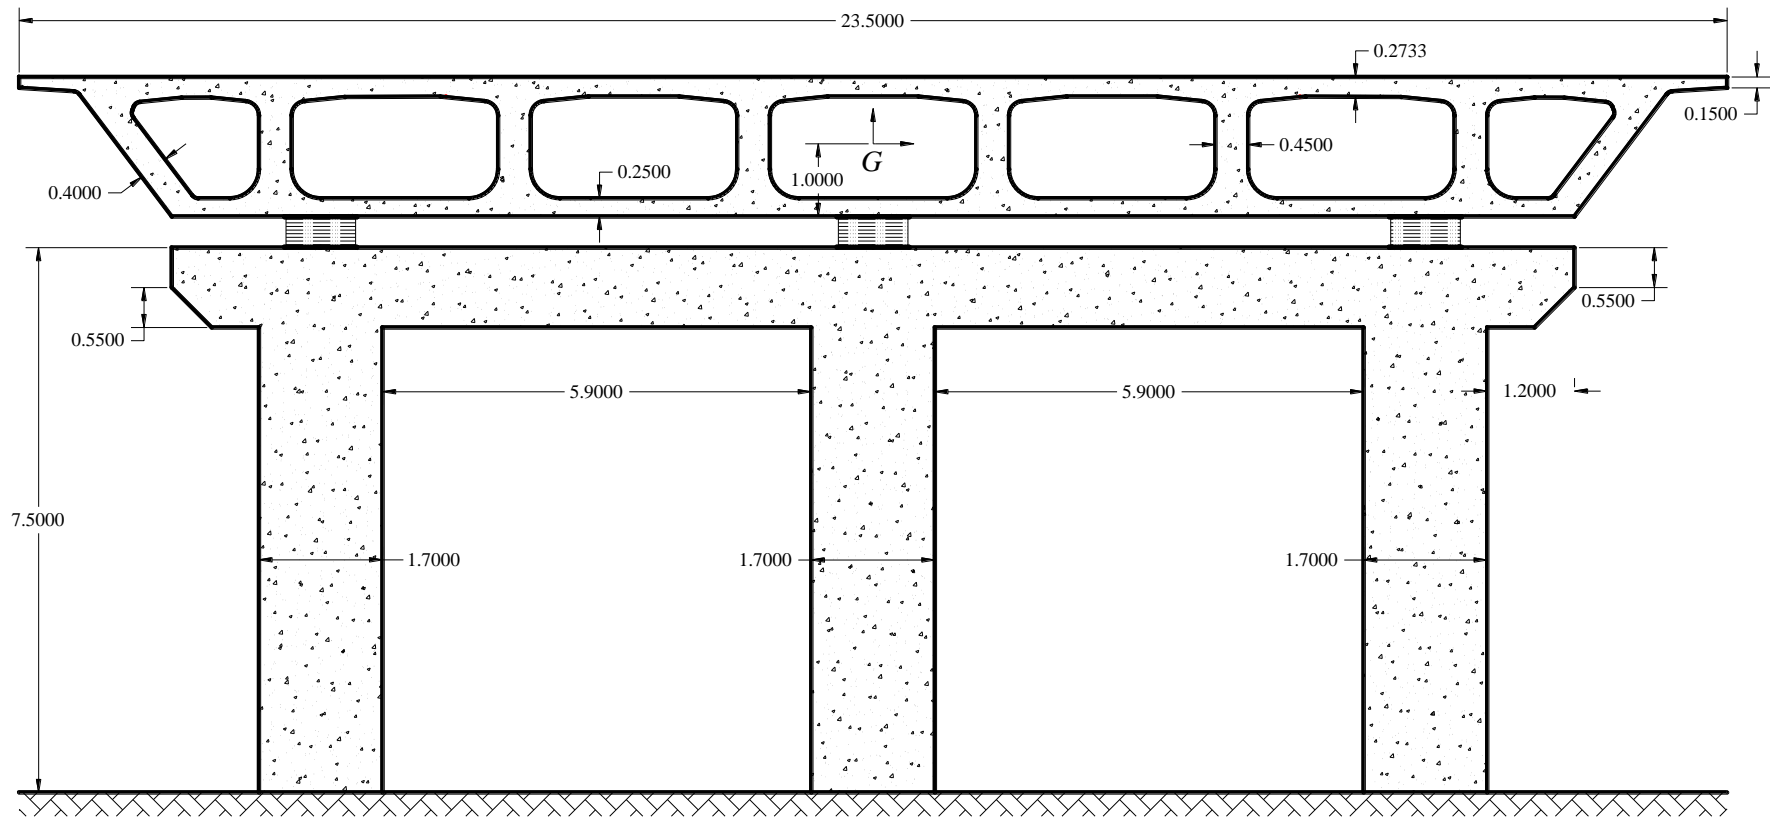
Cross-section of Bridge C. Units in meters.
